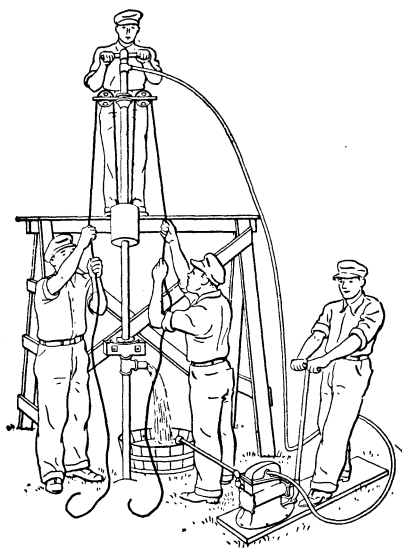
Method of constructing a well by jetting—water is forced to the jetting tool by means of a hand pump.
